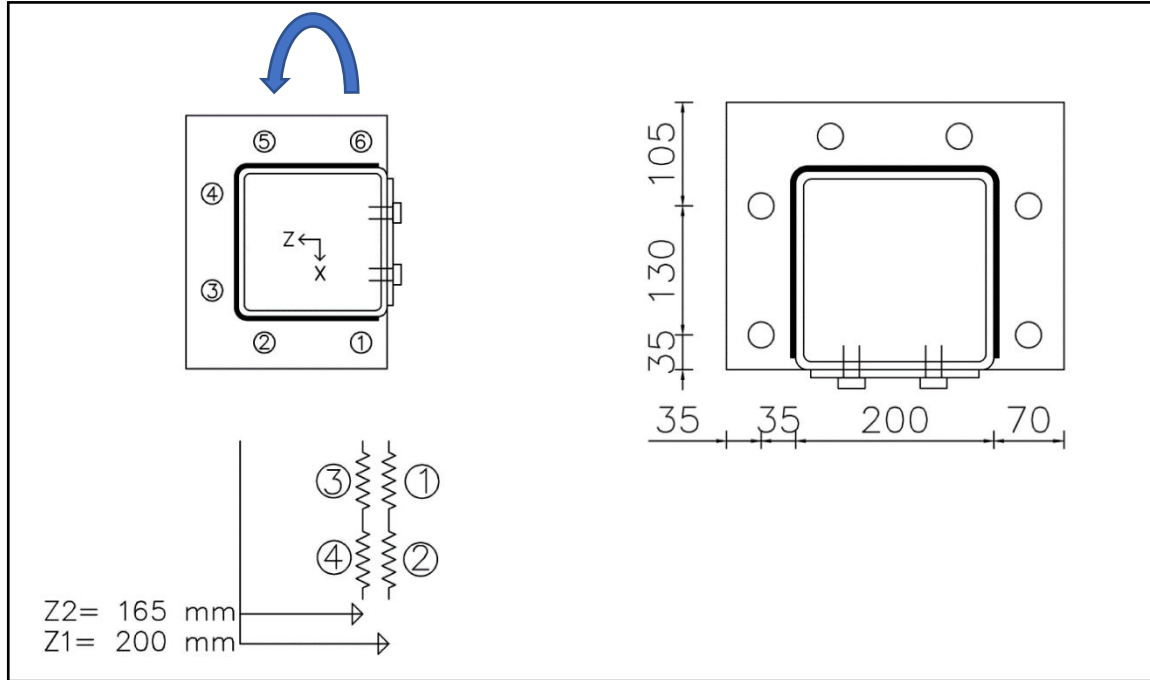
Plan and elevation of specimen IC-1 (case 2)
